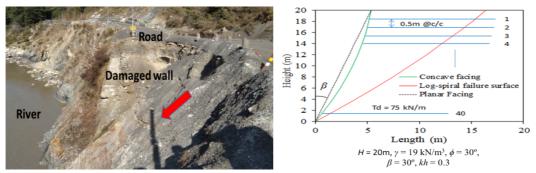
Design of Concave Retaining Structure for the Section Below the Road at the Landslide
